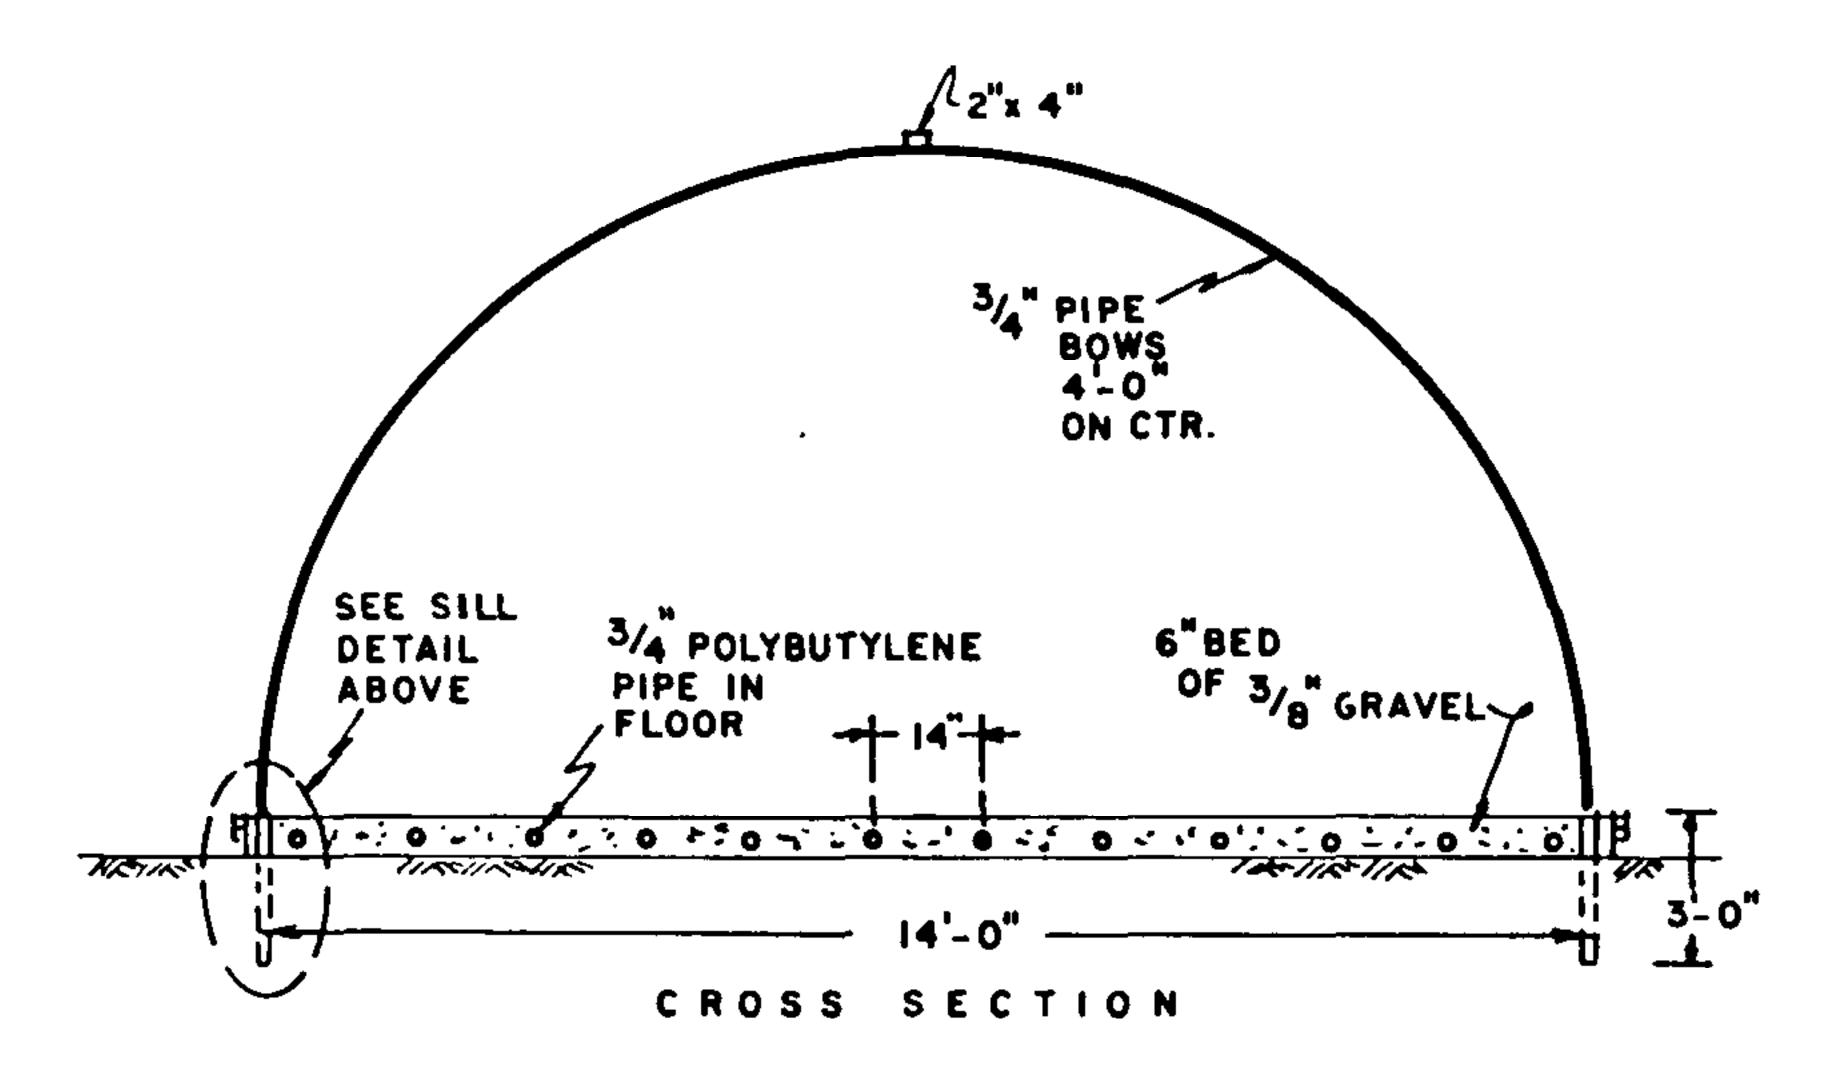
New Jersey Plan 153: Construction details of a floor heated nursery storage house.
